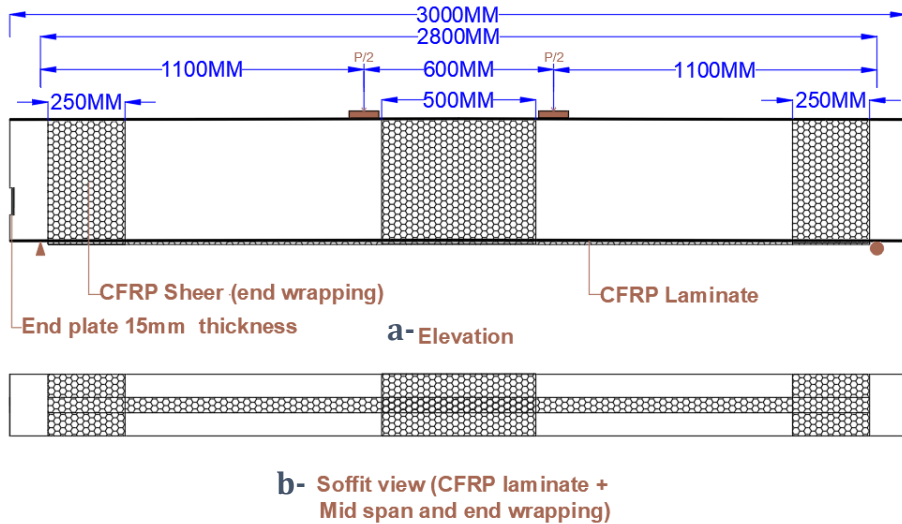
Laminate with middle and end sheet anchorage, a- elevation b- soffit view
